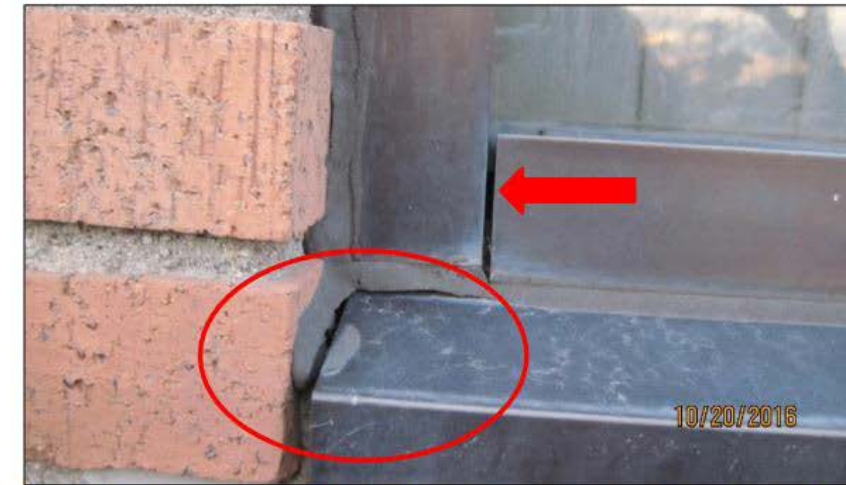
Failed window to masonry wall joint, area outlined in red. The snap on window cover is short of the vertical cover, area shown with red arrow.
